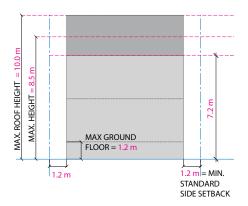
SIDE ELEVATION SHOWING MAXIMUM SIDE WALL AREA
